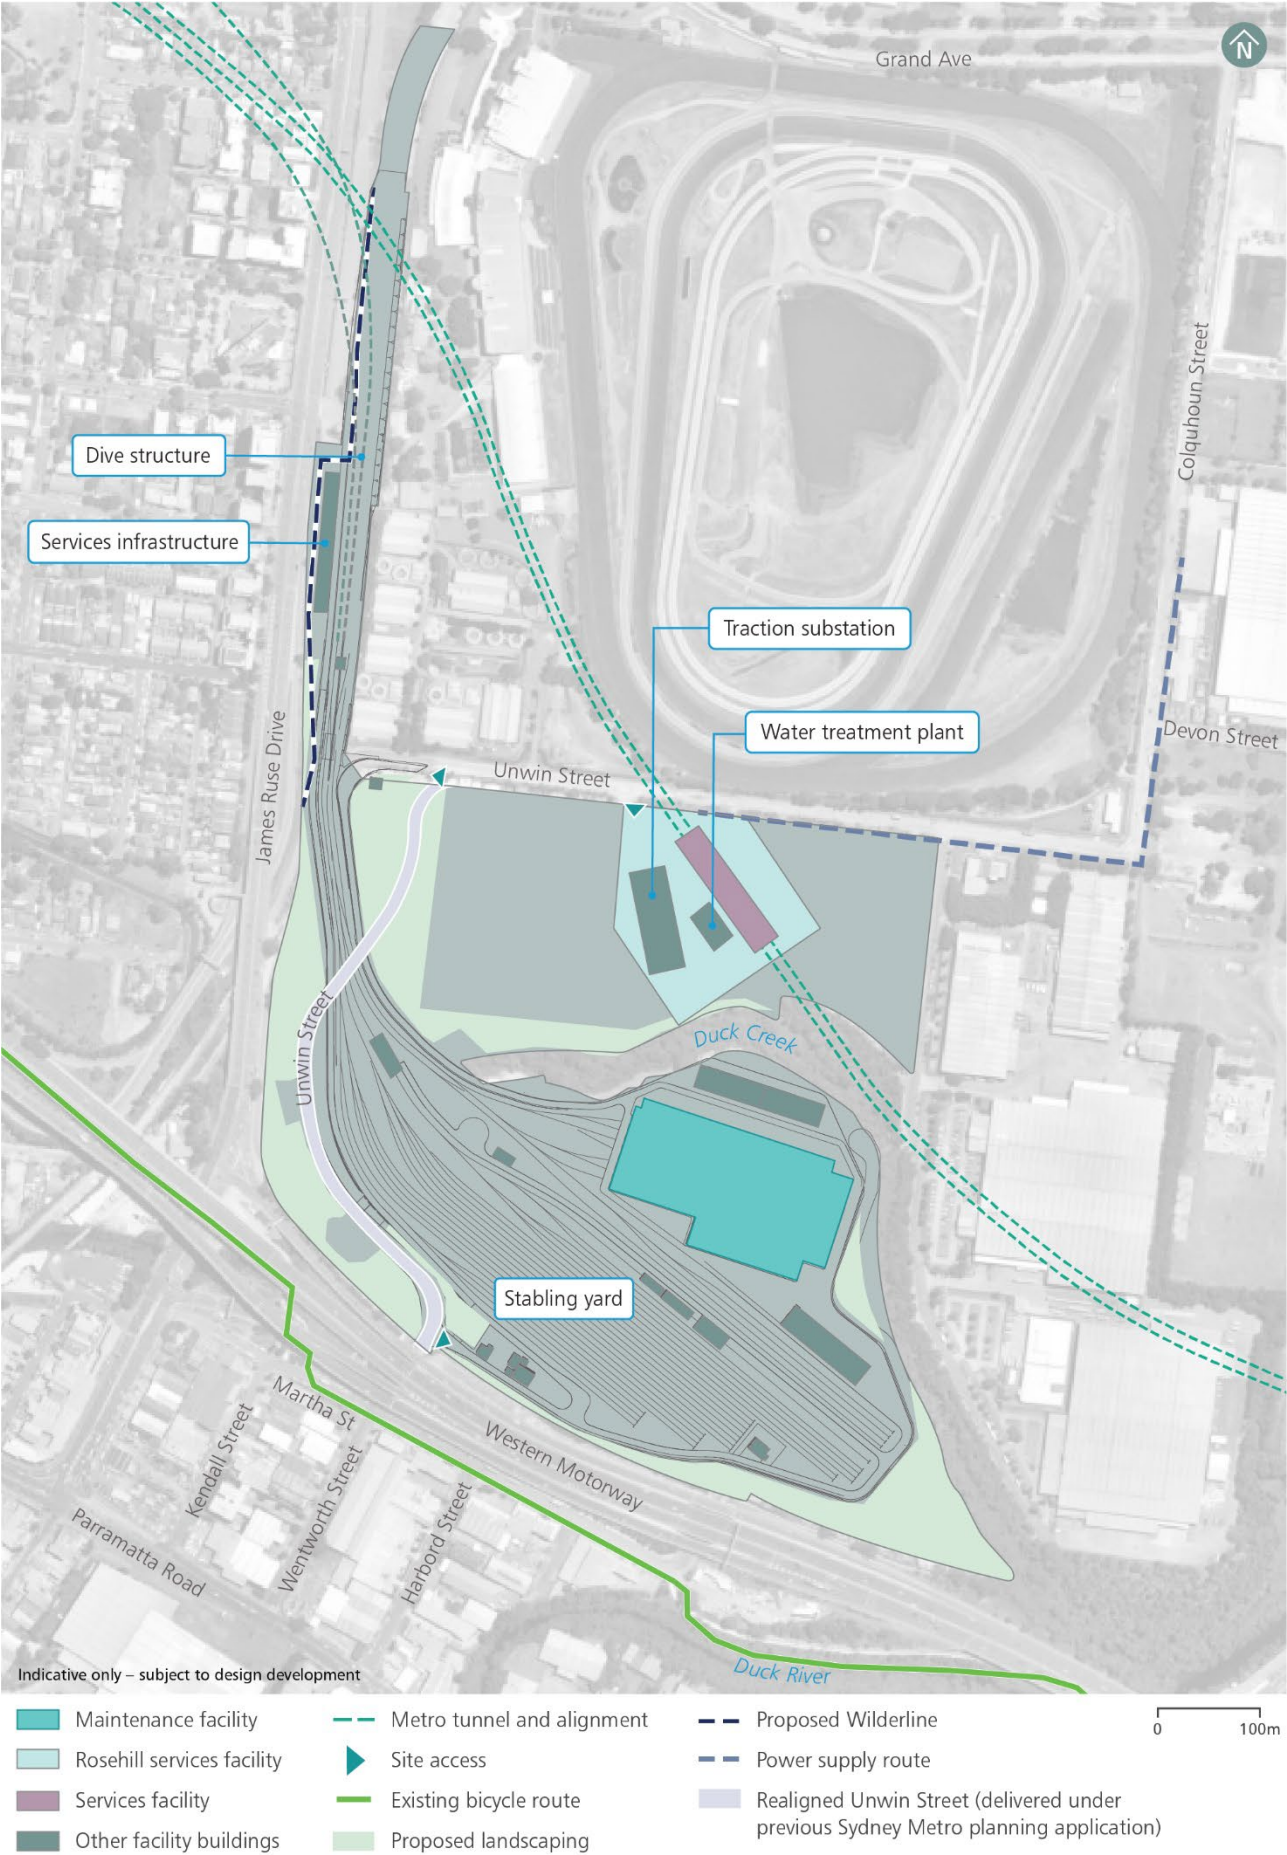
Indicative layout – Clyde stabling and maintenance facility and Rosehill services facility
